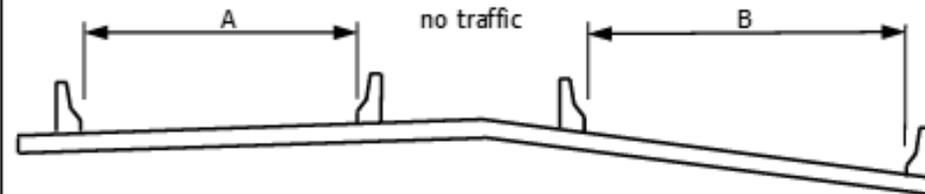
Cross-section view of a bridge deck with multiple median barriers.
